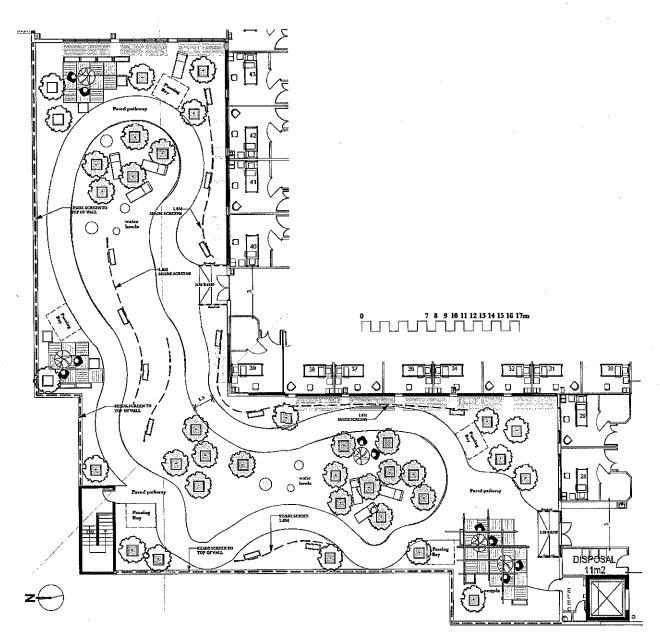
LANDSCAPE PLAN FOR EXTERNAL TERRACE
